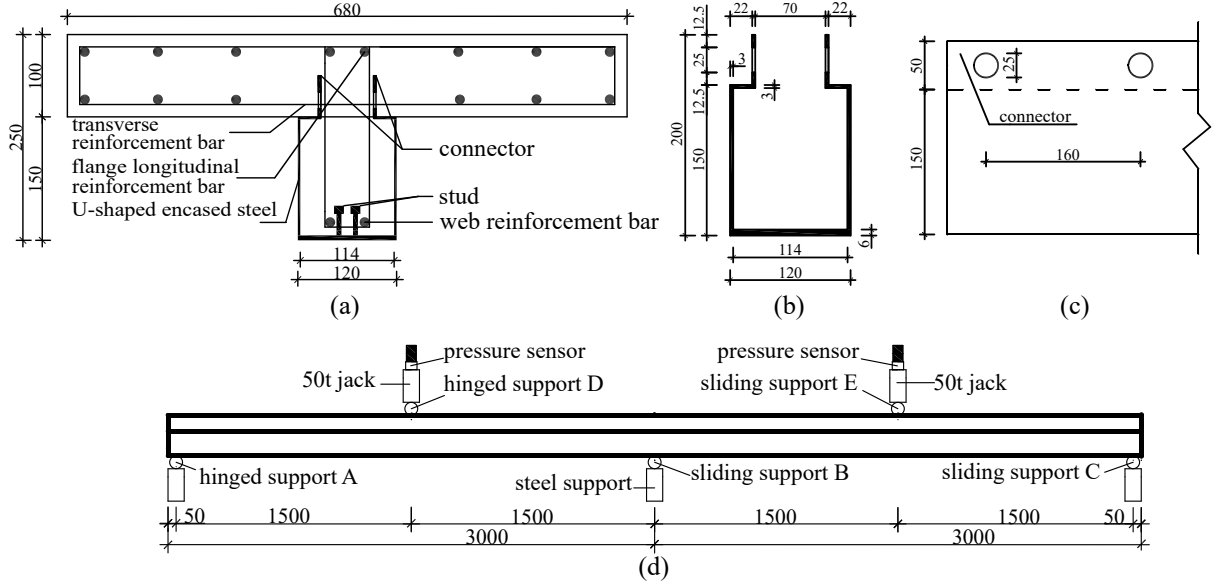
Details of the tested VUSCCB specimen (dimensions in mm): (a) typical cross-section; (b) U-shaped steel (front view); (c) U-shaped steel (side view); and (d) elevation view of the test model.
